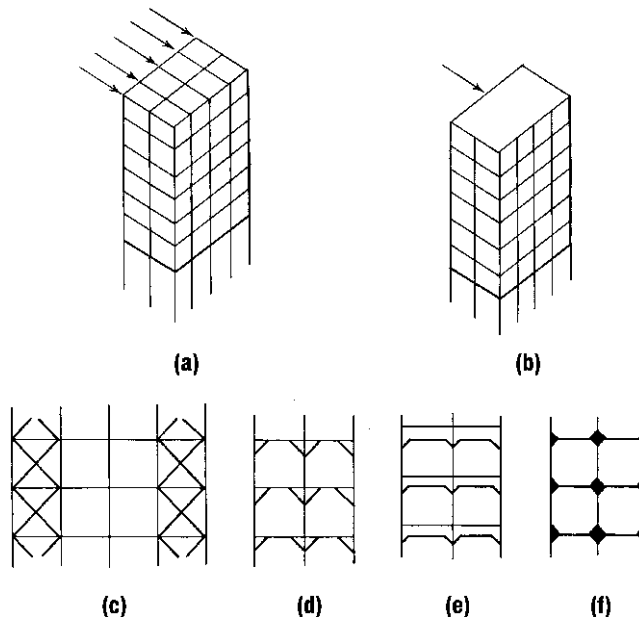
Bracing for high-rise buildings: (a) All transverse bents resist lateral forces; (b) building acts as a vertical tube; (c) bent with X bracing; (d) knee bracing between columns and girders; (e) haunched spandrels; (f) moment-resisting connections between columns and girders.
